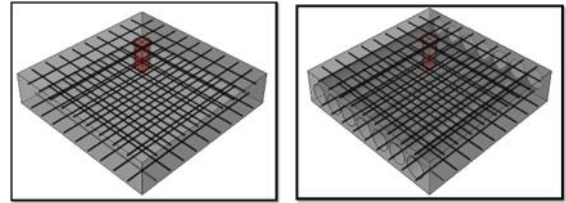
Model of Solid Precast Slab and Hollowcore Precast Slab
